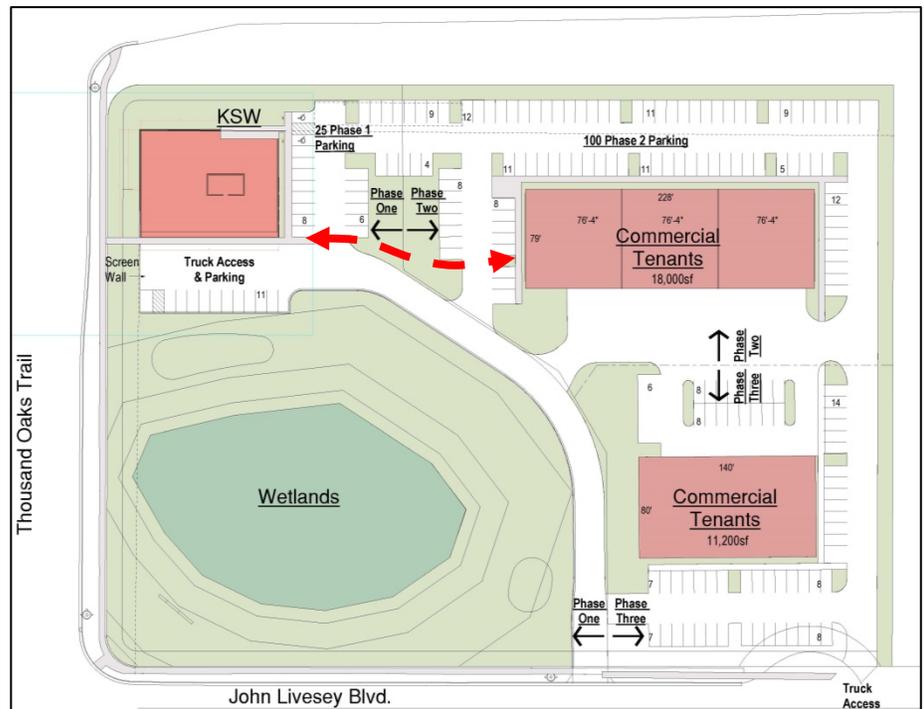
Initial plan with a red dashed line illustrating a potential pedestrian connection
